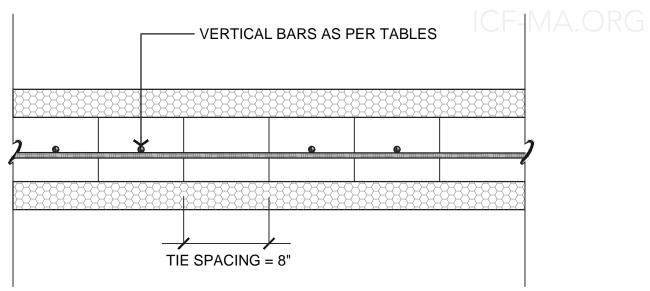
Three Horizontal Bars in Every Two Rows of 18" High Block to Achieve an Average Spacing of 12" O.C.
